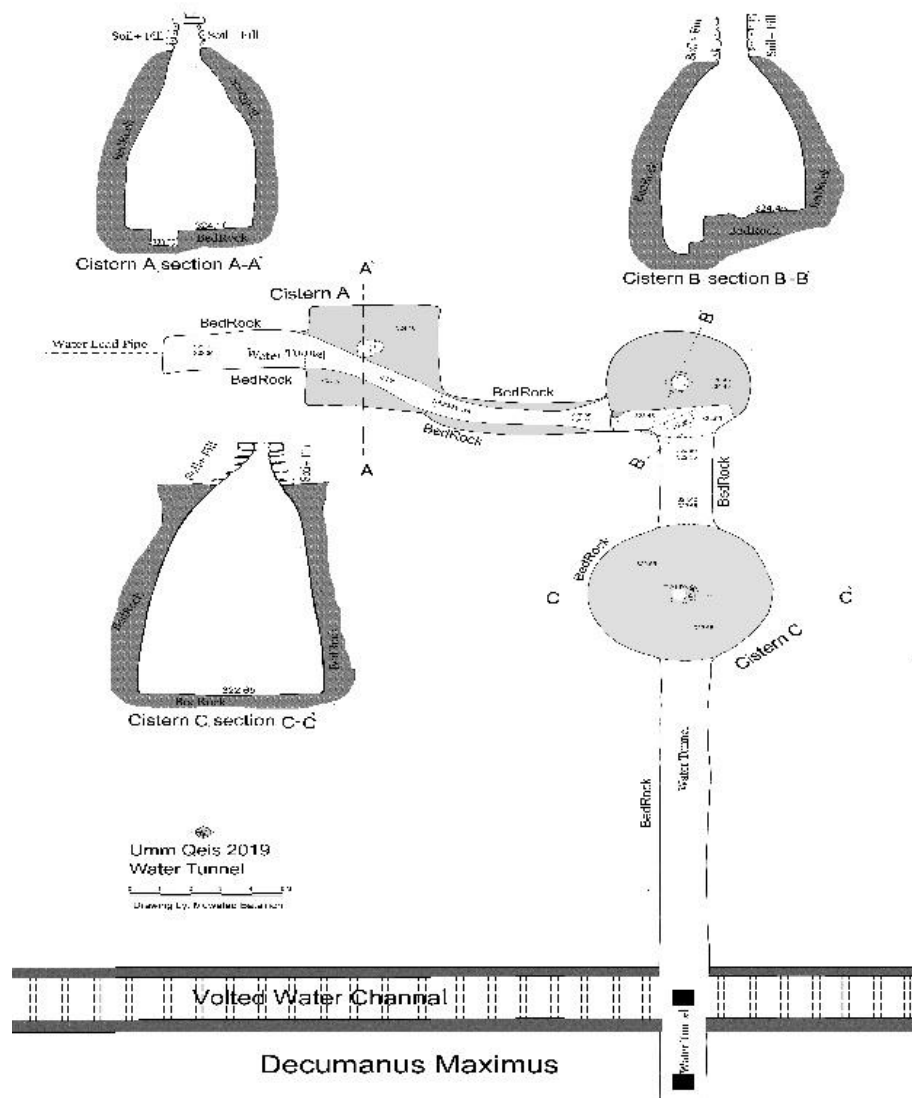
The hydraulic system general plan with cross sections of the wells (Shiyab, 2019).
